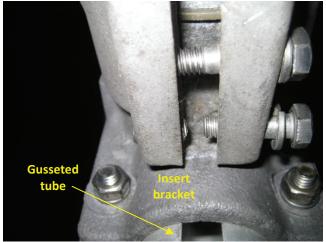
1 of 2 clamp bolts broken at orbital bracket
